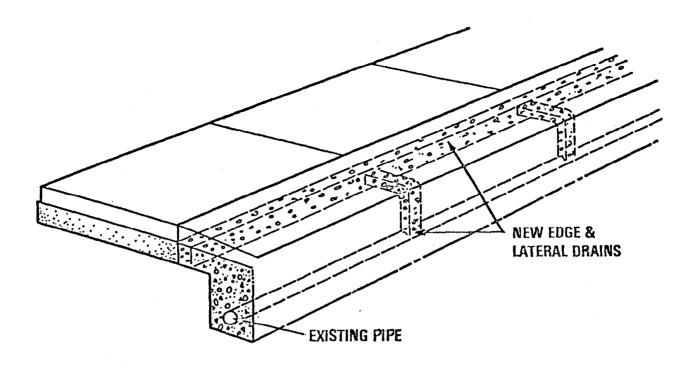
Utilizing New Edge and Lateral Drains With Existing Drain Pipe (25)
